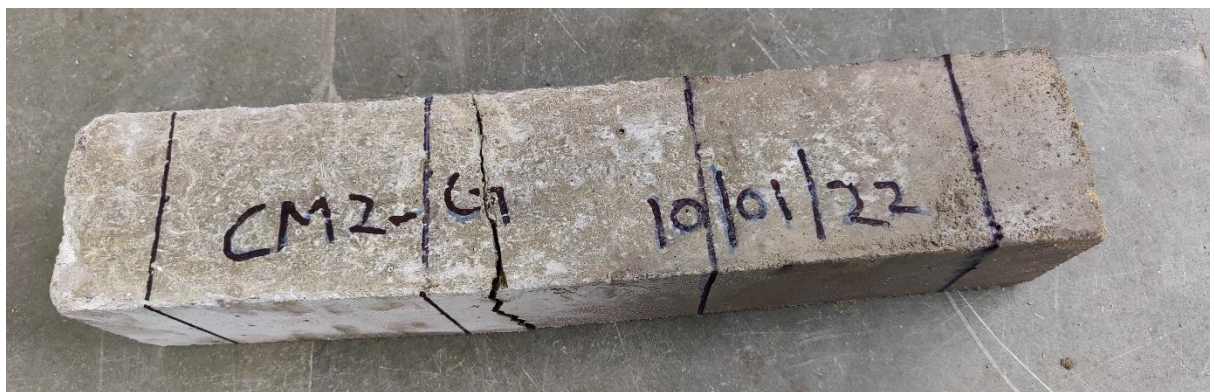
Top view of crack pattern in beam specimen used in present study
